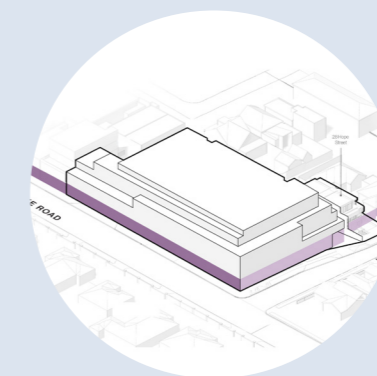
3D view towards Burke Road vehicle access with activated returns (December 2023 Scheme) (source: Cera Stribley)
